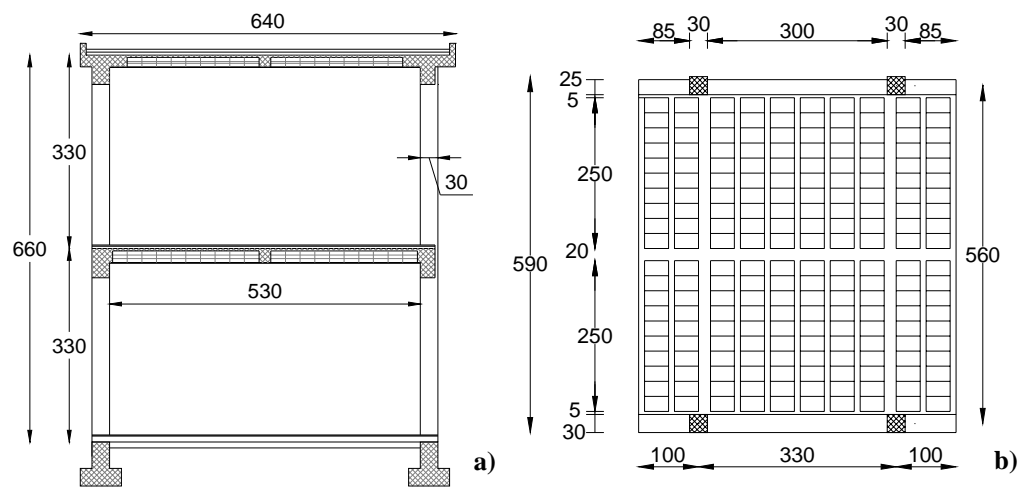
Transversal section (a) and detail of the slab (b) of the structure (length unit: cm)
